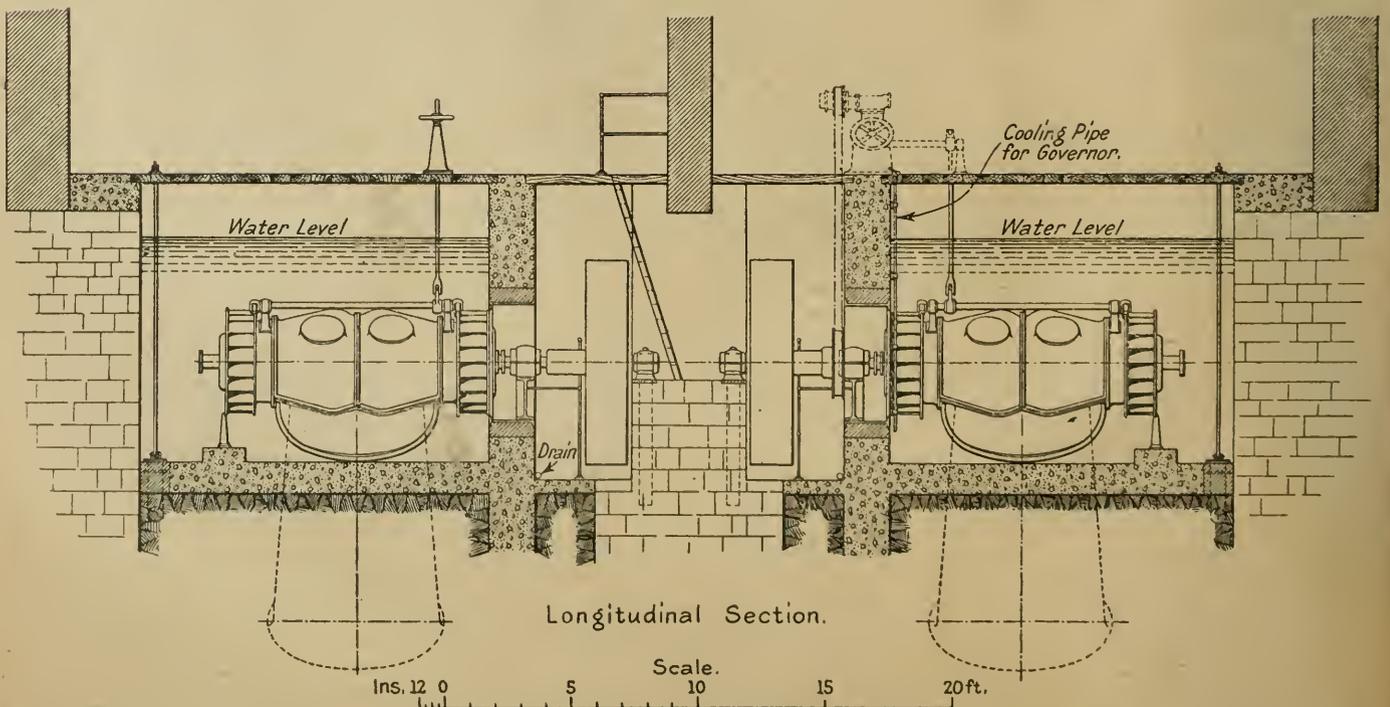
LONGITUDINAL SECTION OF HYDRO-ELECTRIC AND ACCUMULATING POWER PLANT.
